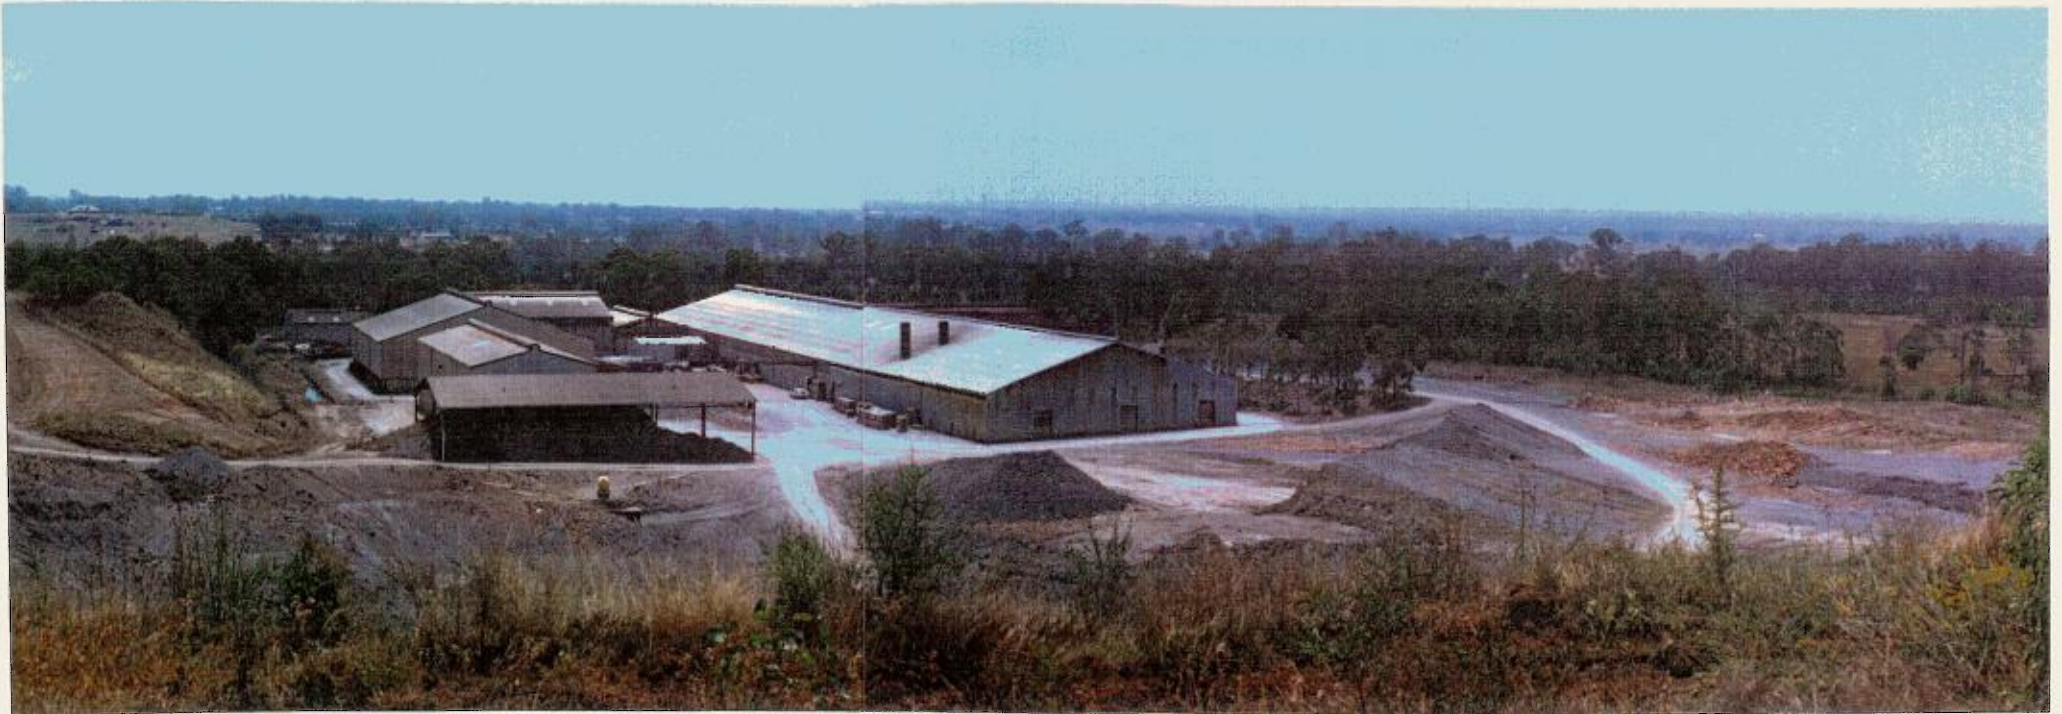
Panorama of existing plant viewed from above the existing quarry. The new plant will be located adjacent to the existing buildings on the right of the photo.
